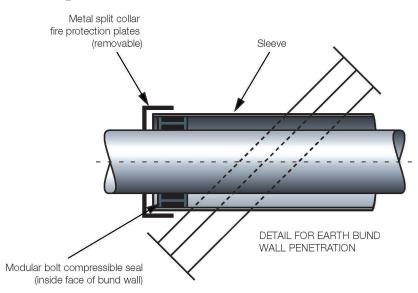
Detail for earth bund wall penetration (HSE, 2009a)
